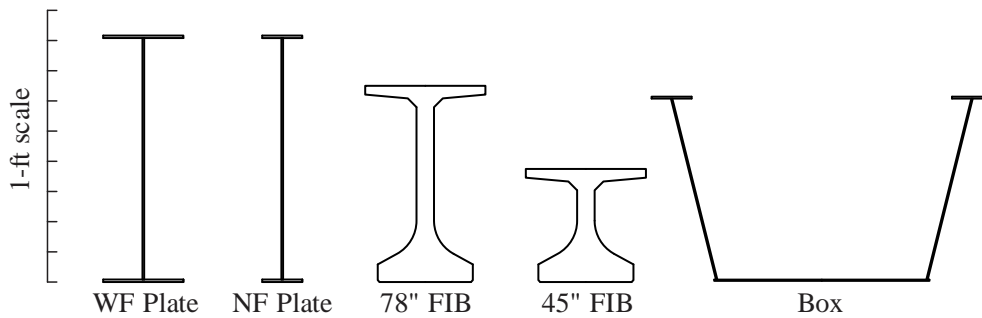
Girder cross-sections used in study (drawn to scale)
